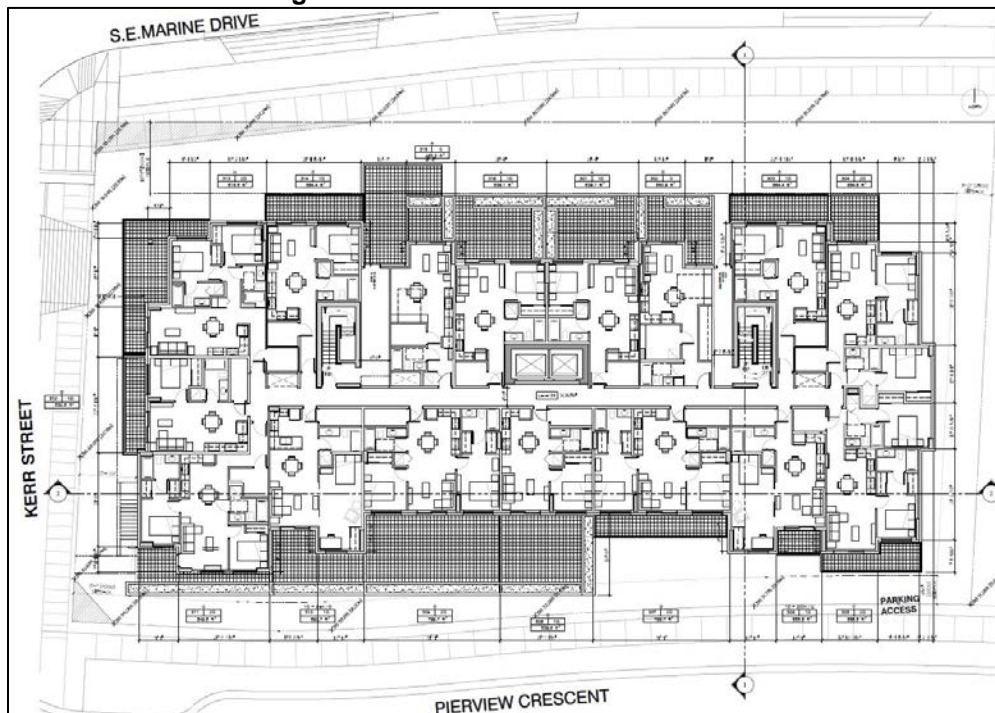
Concept Plan Showing the Proposed Extension of Pierview Crescent
